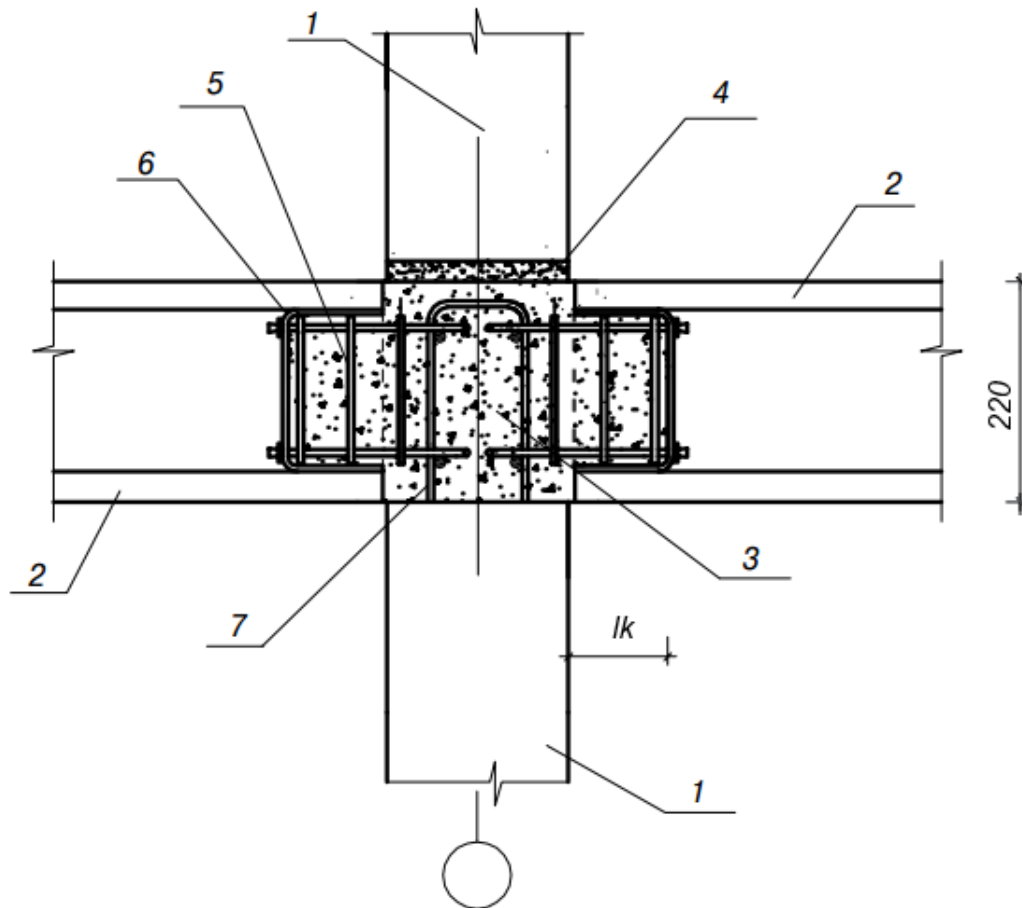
Combined joint of multi-hollow slabs with wall panels:
